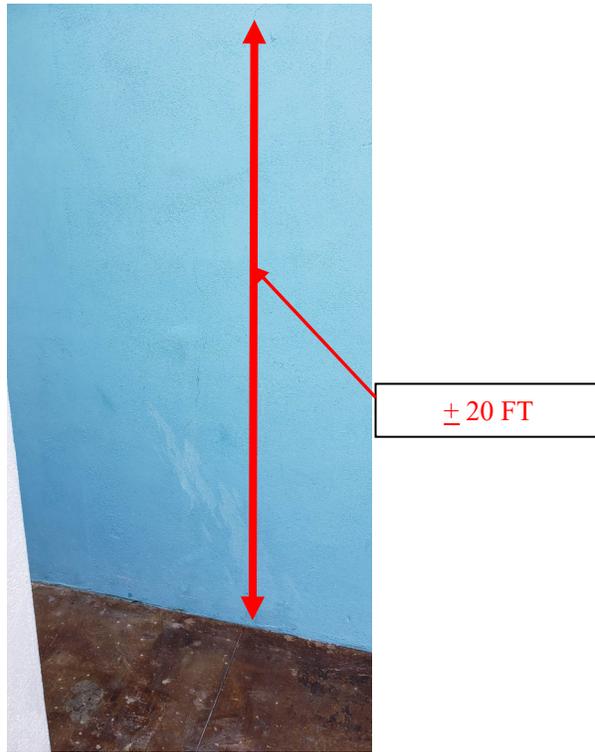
Location 6: Approximately 20 ft long new 12x8 concrete column. See detail 6/S104.
